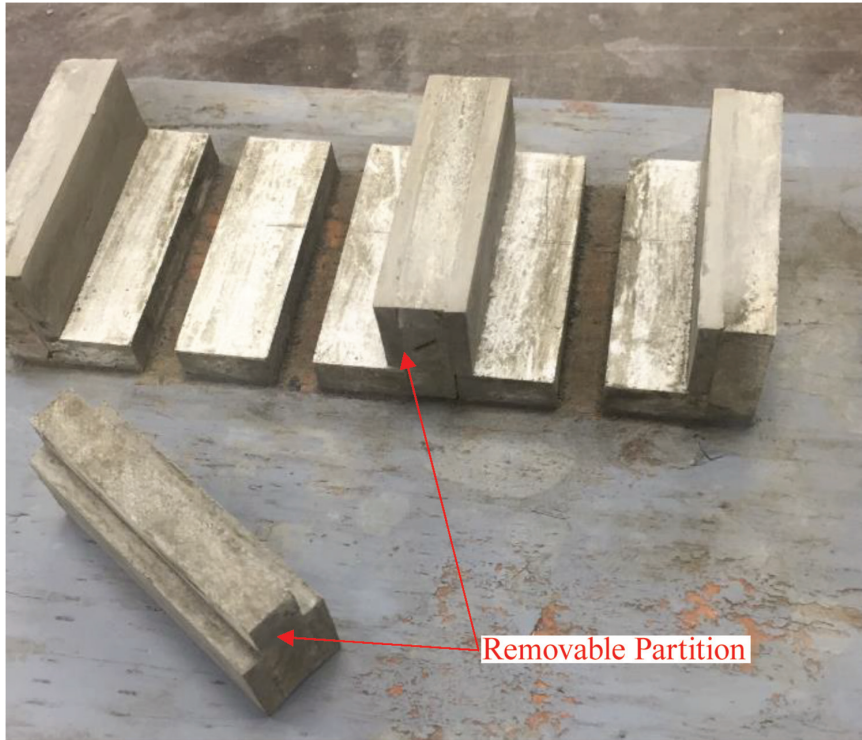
Five 40 mm (1.57 in.) long mold-cast specimens.
